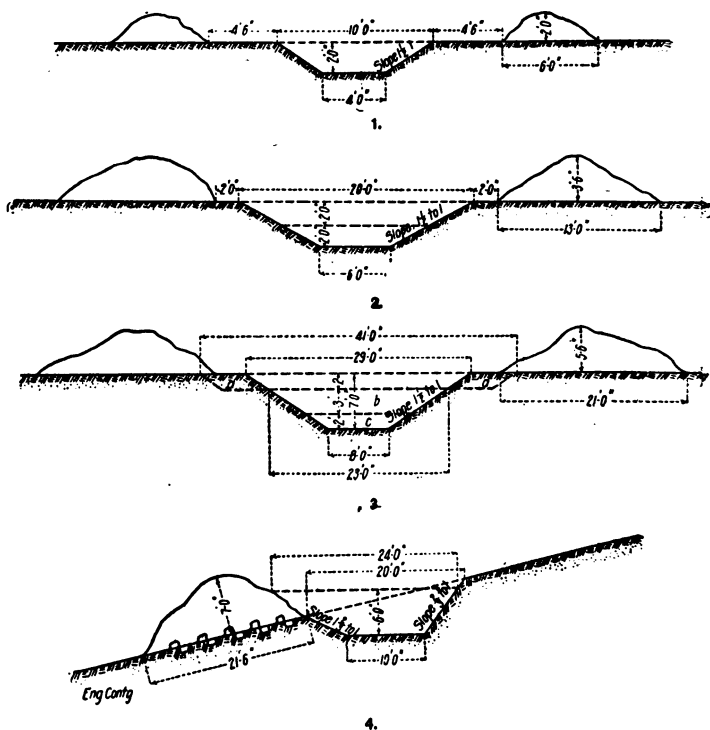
Sizes of Ditch That Can Be Dug with Elevating Graders.
